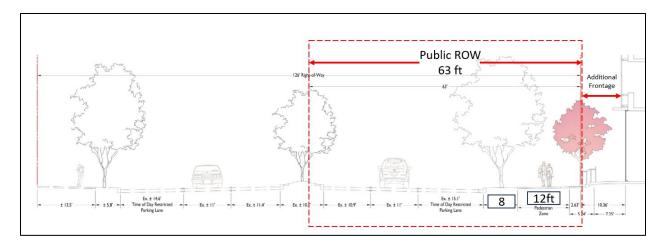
Project Cross Section of Georgia Avenue, looking north, Site frontage shown in red dashed box.
